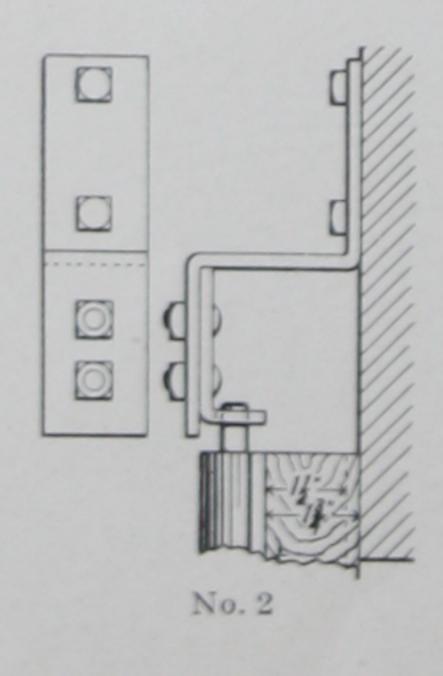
2 in. to $2\frac{1}{4}$ in. lap hinged doors swinging in; right angle or sliding doors, any track.
